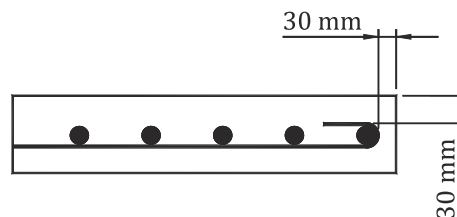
All types of reinforcement of solid slabs, structural concrete walls or joists, when not exposed to weather or in contact with ground (Minimum concrete cover: 30 mm)
